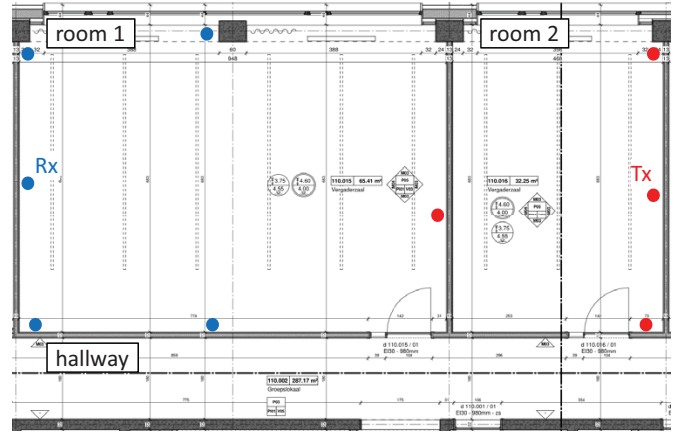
Floor plan with locations of the Tx and Rx arrays
